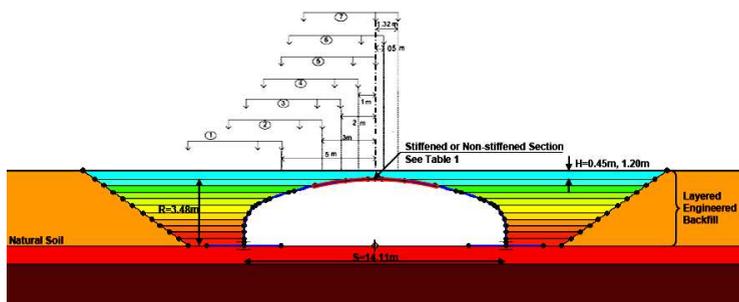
Cross-sectional geometry of the box culvert and the truck positions where the truck approaches the bridge backwards
